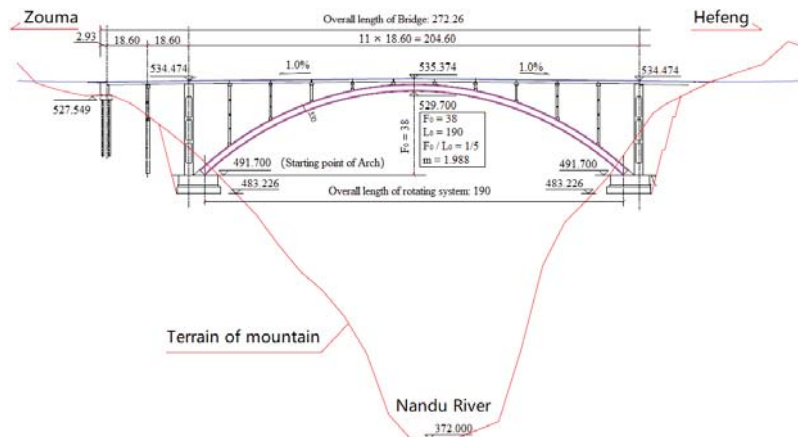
The layout of the Nandu River Swing Bridge (unit: m).
